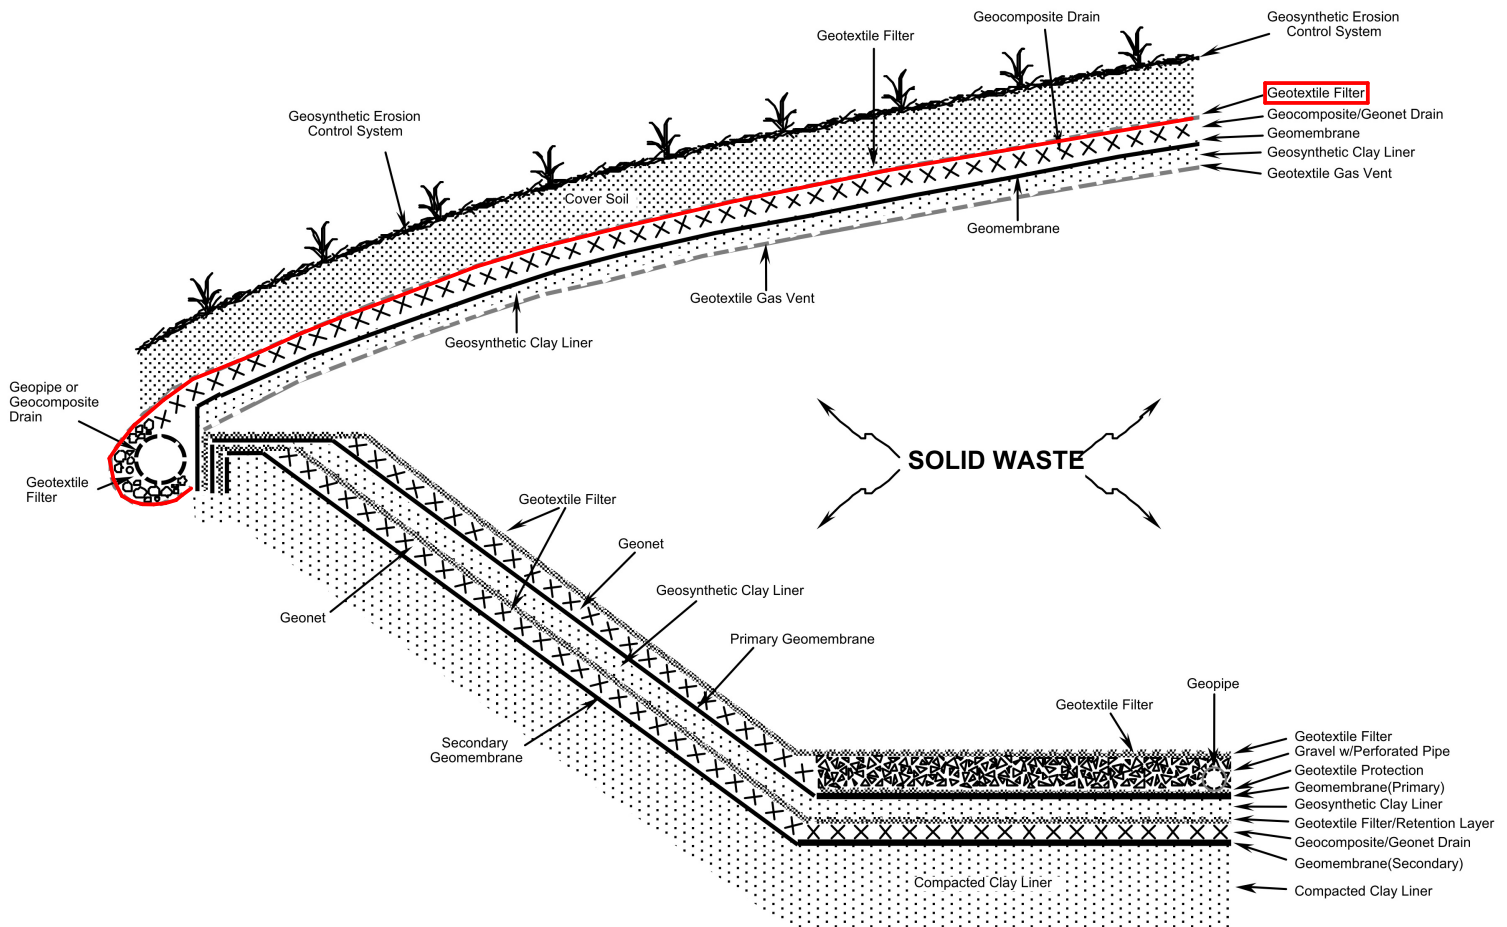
Schematic drawing shows the layers of a typical landfill after Bonaparte et al. (2002)
